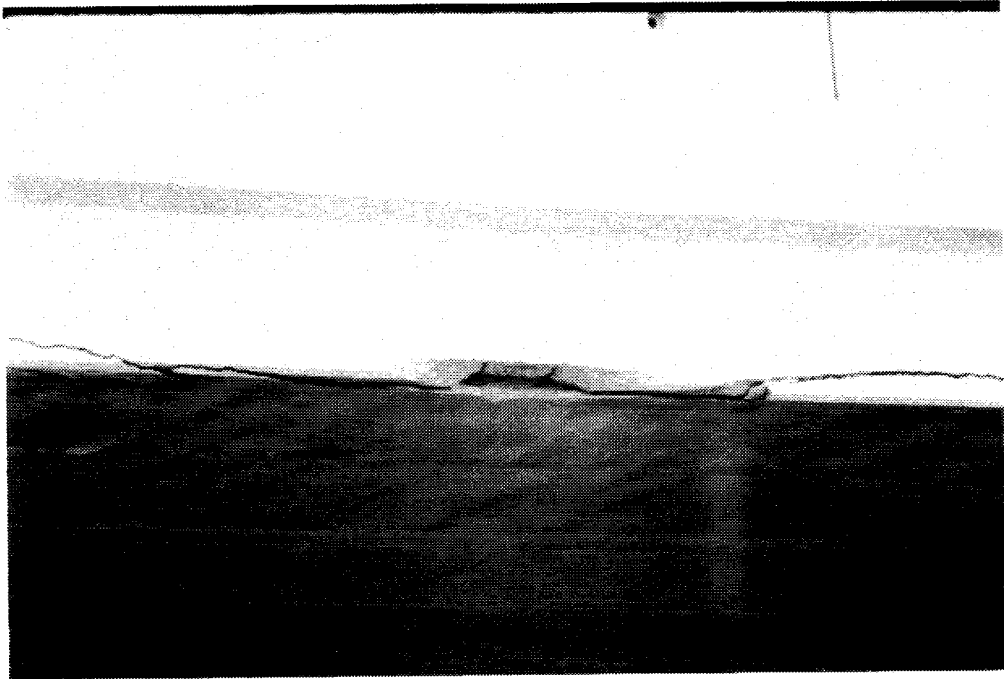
Observed fracture in outer face of concrete box girder
